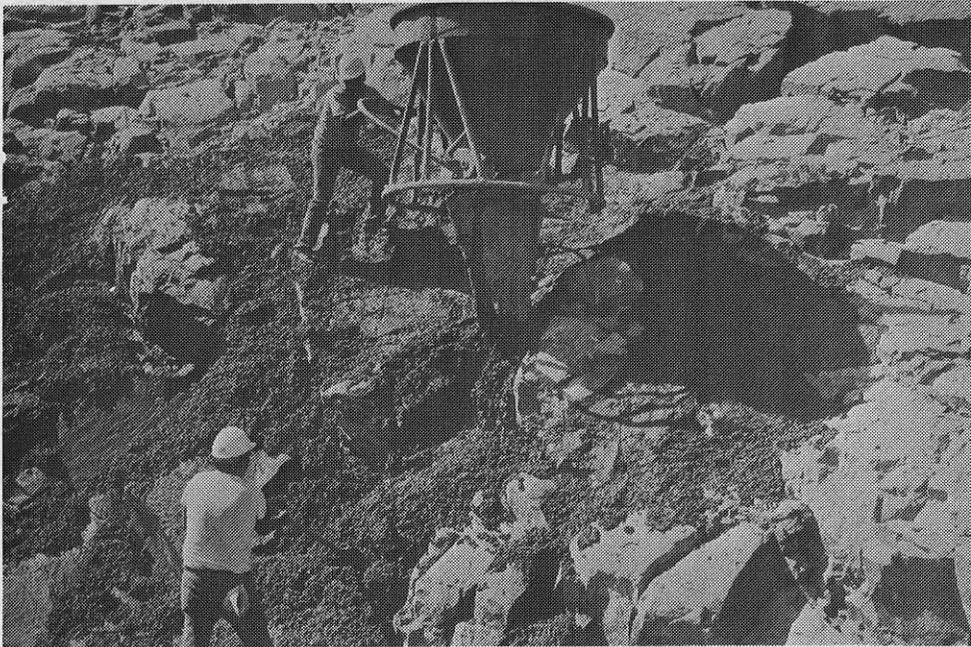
Placing dental concrete on west abutment slope using concrete bucket. October 1984
